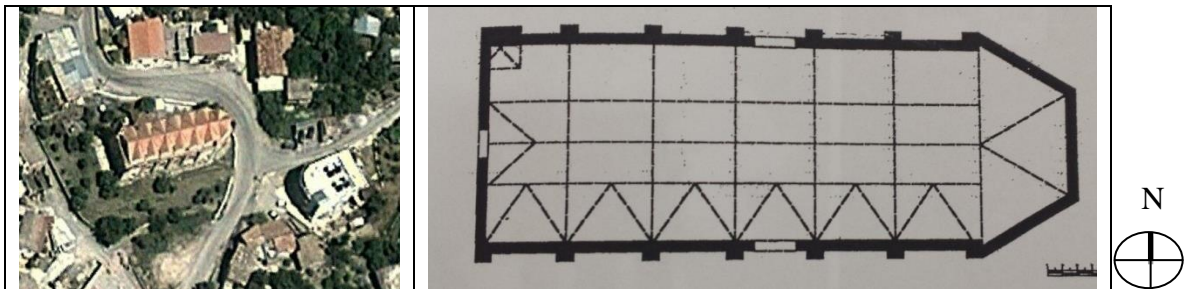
Kythrea, St. George Church, c.19th Century. Site Plan and Sketch Plan of the Church (©Bilgeer - Çıka, 2003:70).
